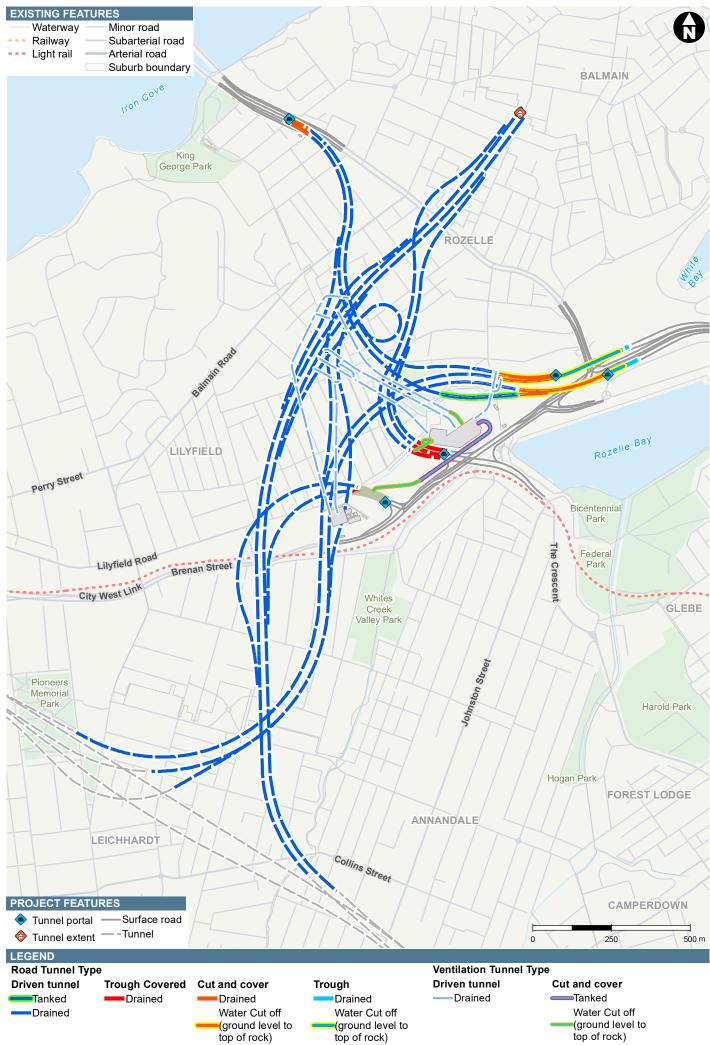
Indicative extent of drained and undrained tunnel sections at Rozelle
